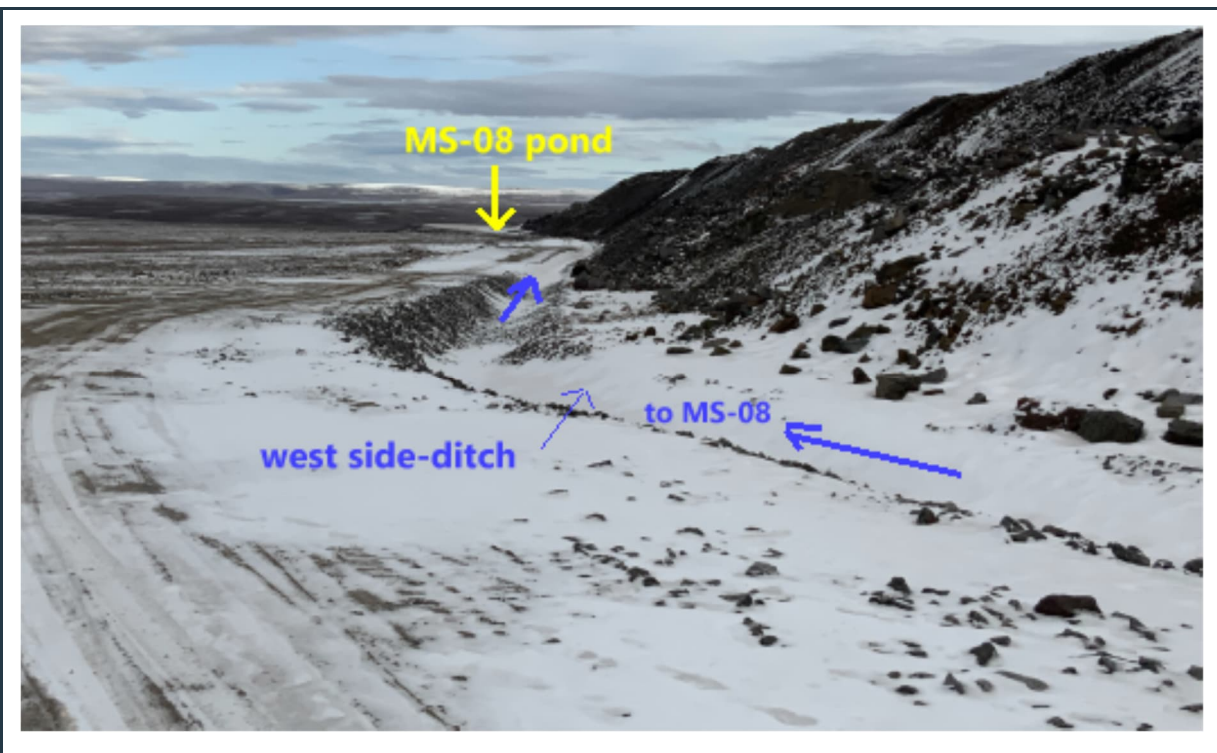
View of the well-maintained drainage ditch around the west side of the waste rock facility, leading to the MS-08 pond. There was already some snow in the ditch in September.
